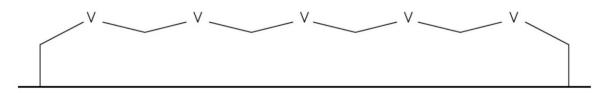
Front view of a greenhouse with continuous roof (double) roof ventilation greenhouse
